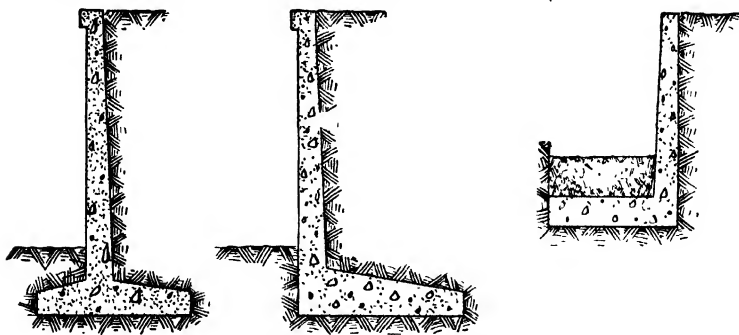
Types of Cantilever Walls. (See p. 849.)
